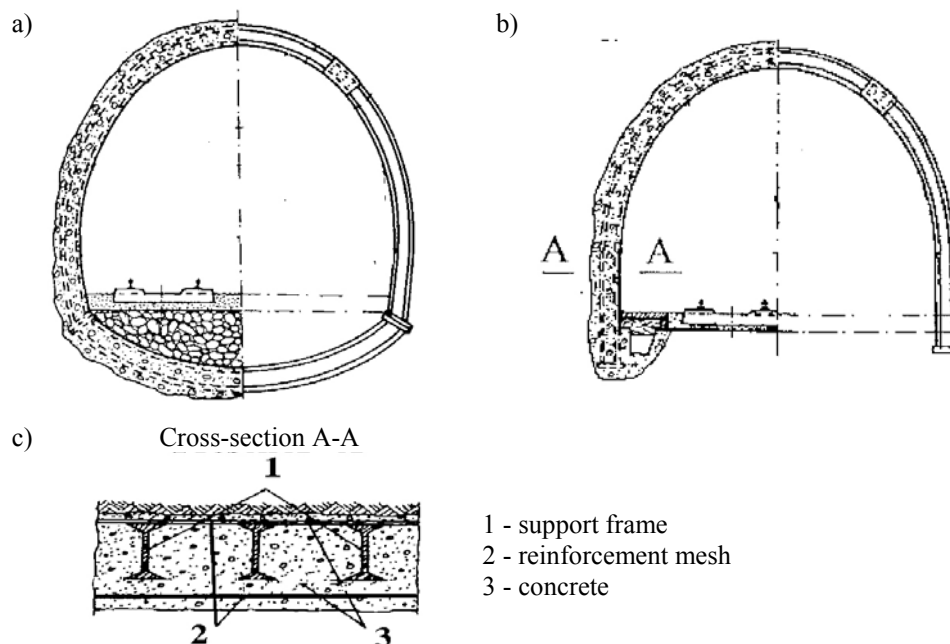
Proposed support method: a) Frame with contra roof; b) Uncompleted frame; c) Support details
